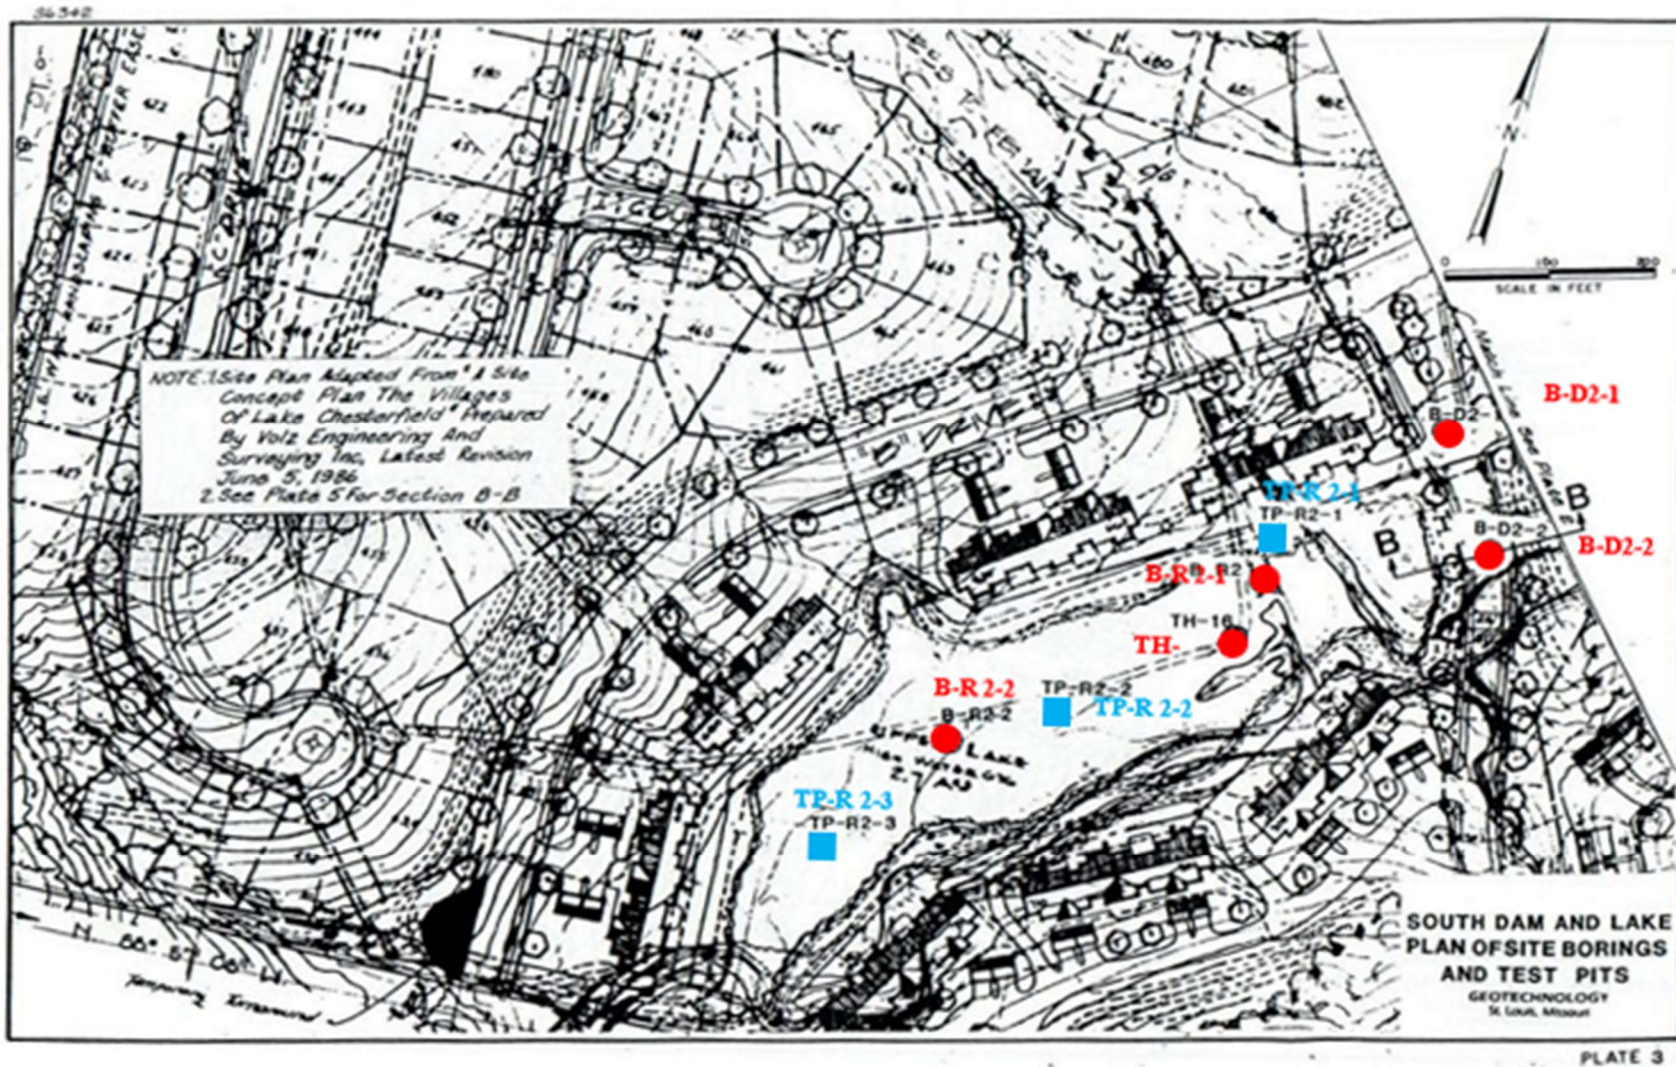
South Dam 'B-B' and lake plan of site borings and test pits (Geotechnology, Inc., 1986).
